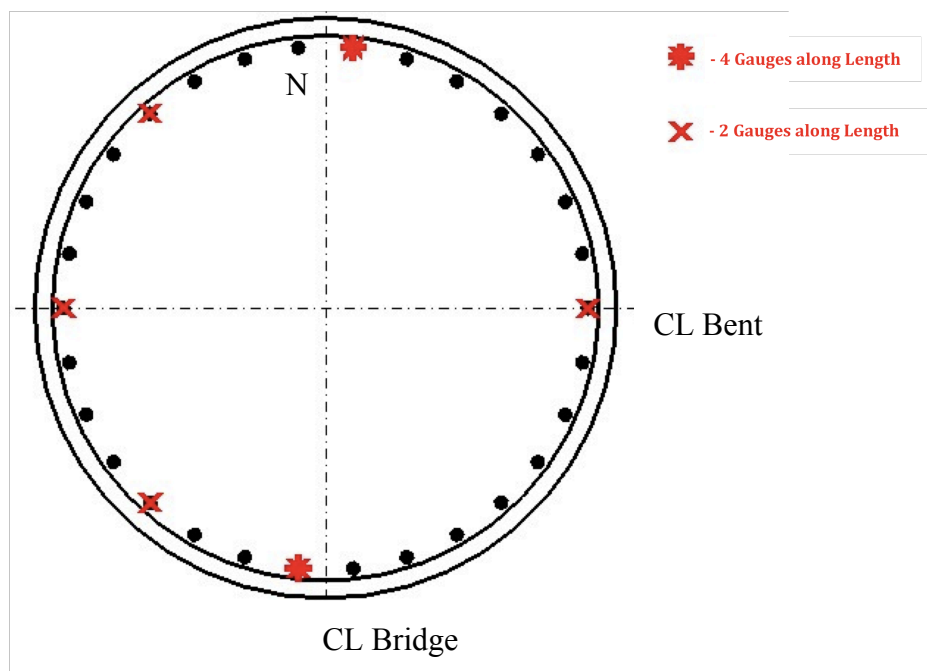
Location of Gauged Longitudinal Column Reinforcement
